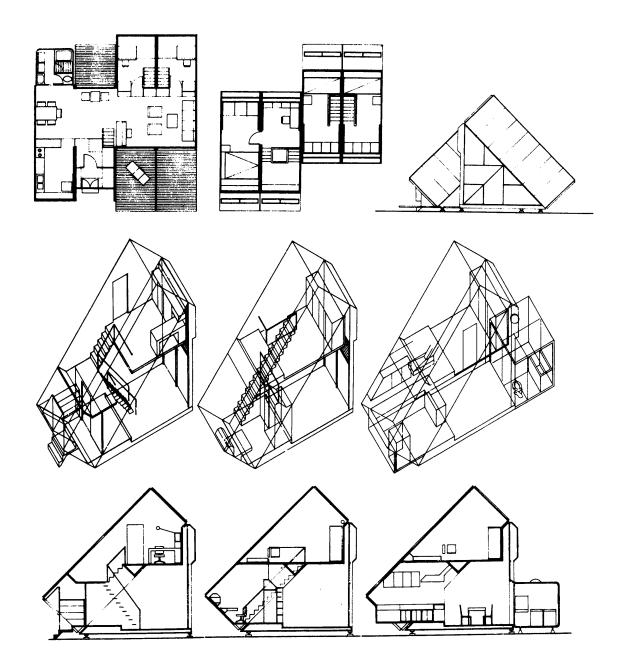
Plan and section of tilted-box units. Notice the use of the tilted back wall as a door and a writing support.
